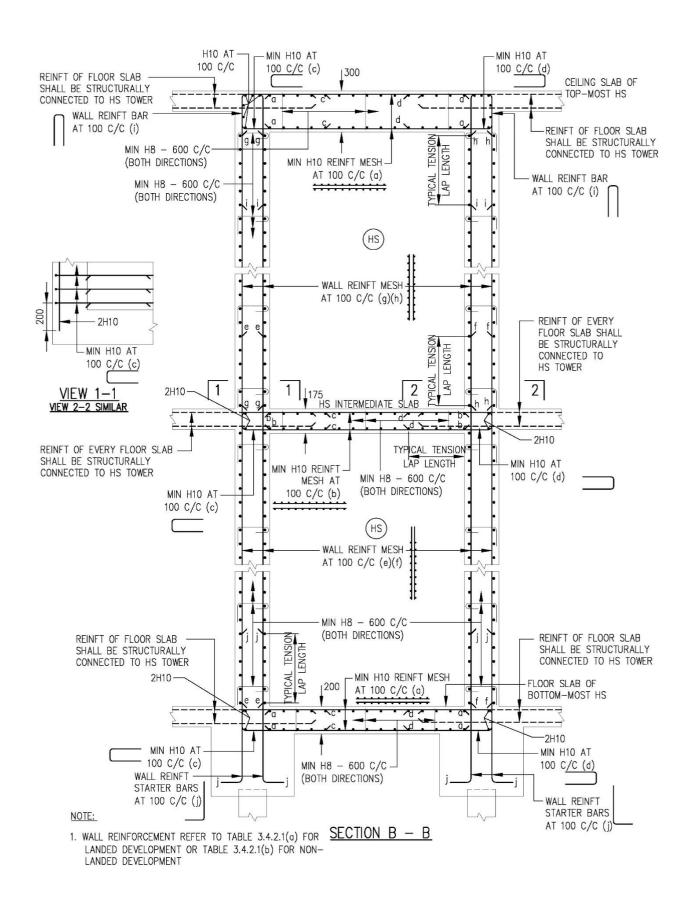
(b) SECTIONAL DETAILS OF HS SLABS/WALLS
